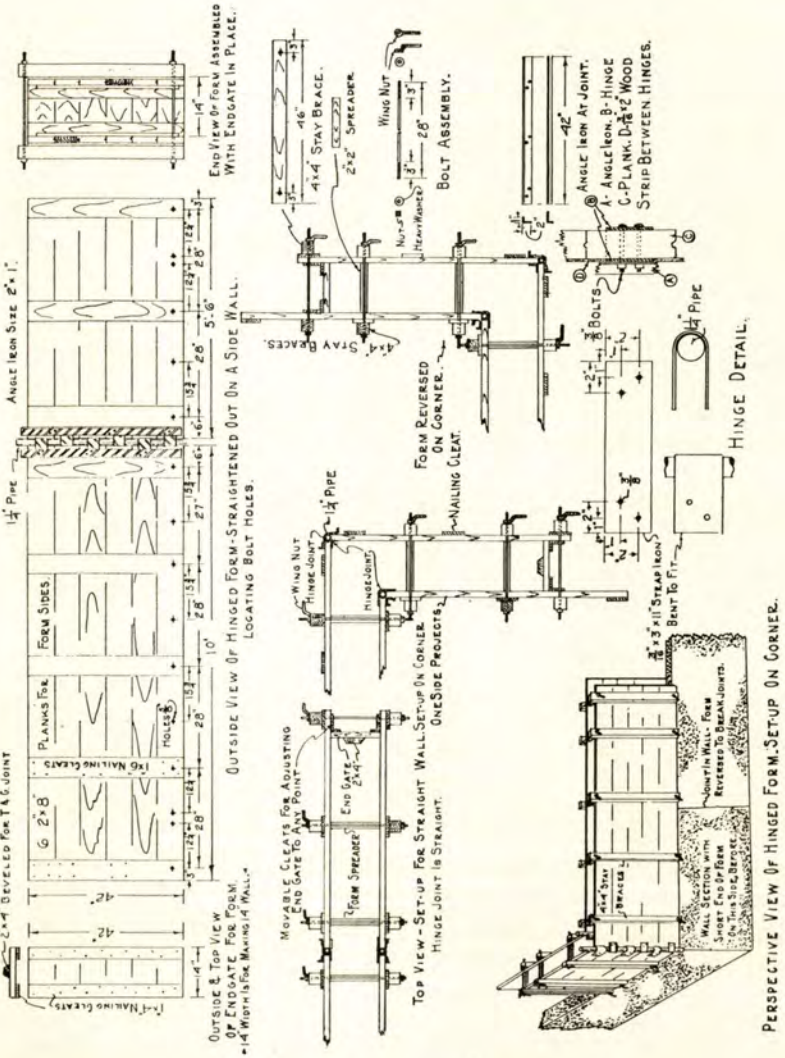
A PLAN FOR A HINGED FORM FOR LARGE WALLS.
